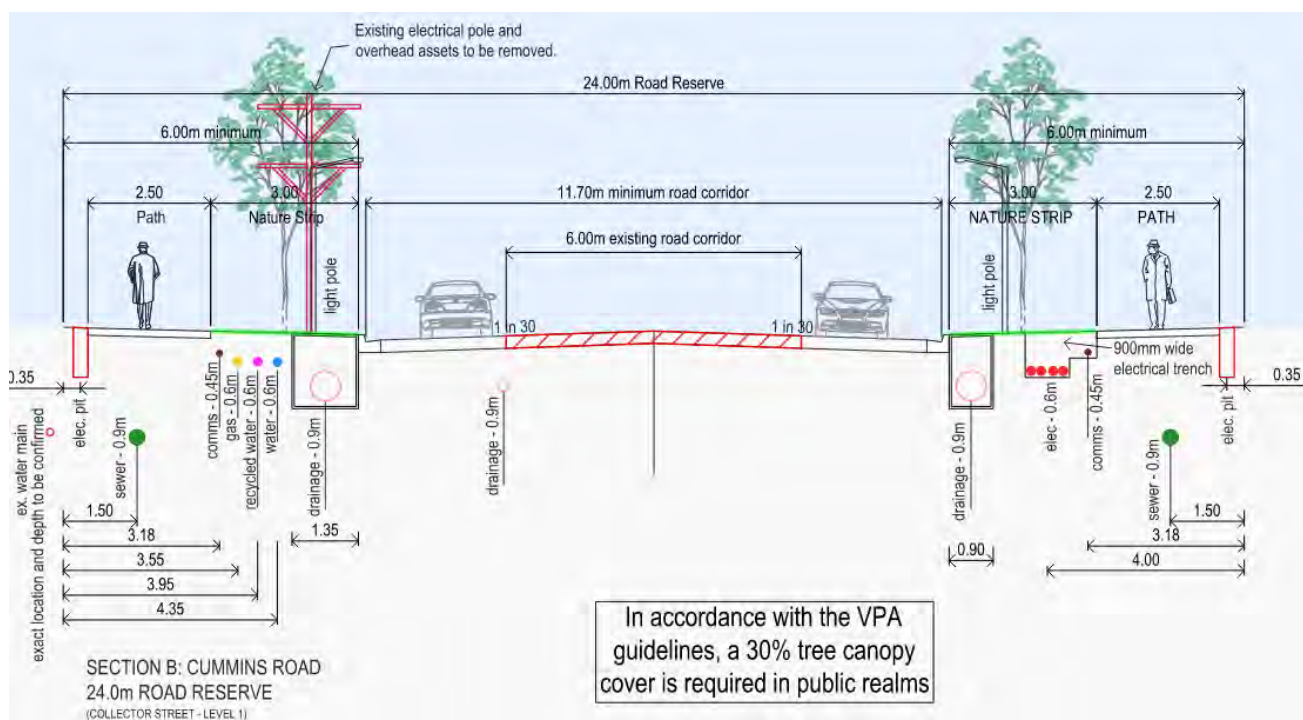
Typical Cross Section - Collector Street Level 1 (Cummins Road)
